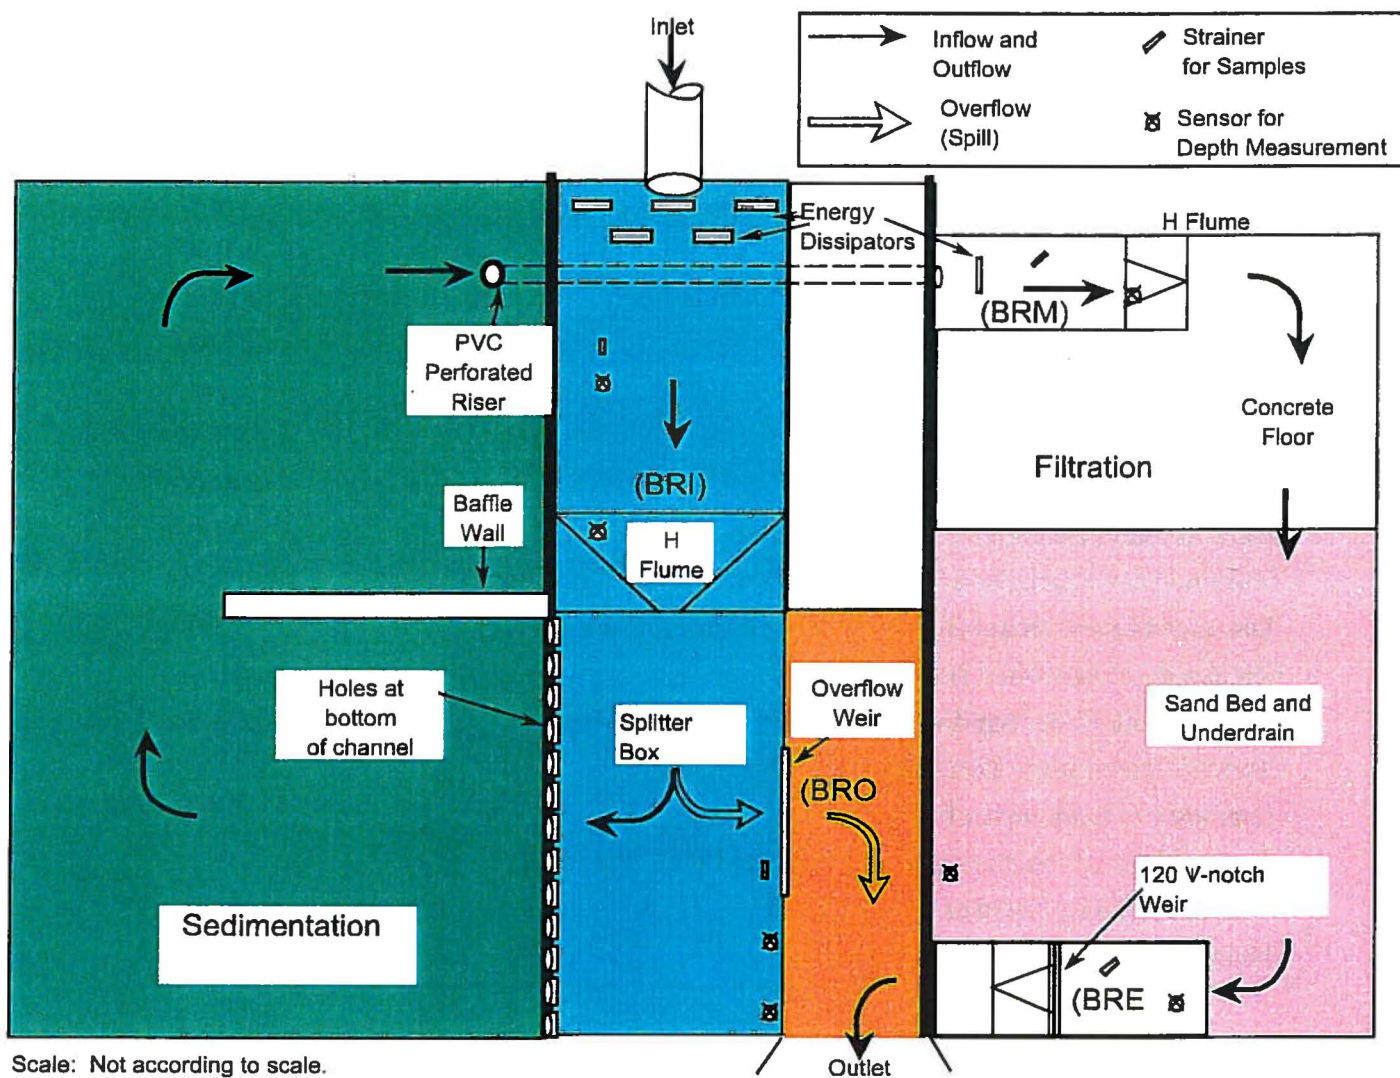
Plan view of ponds and monitoring stations at Barton Ridge Plaza.
